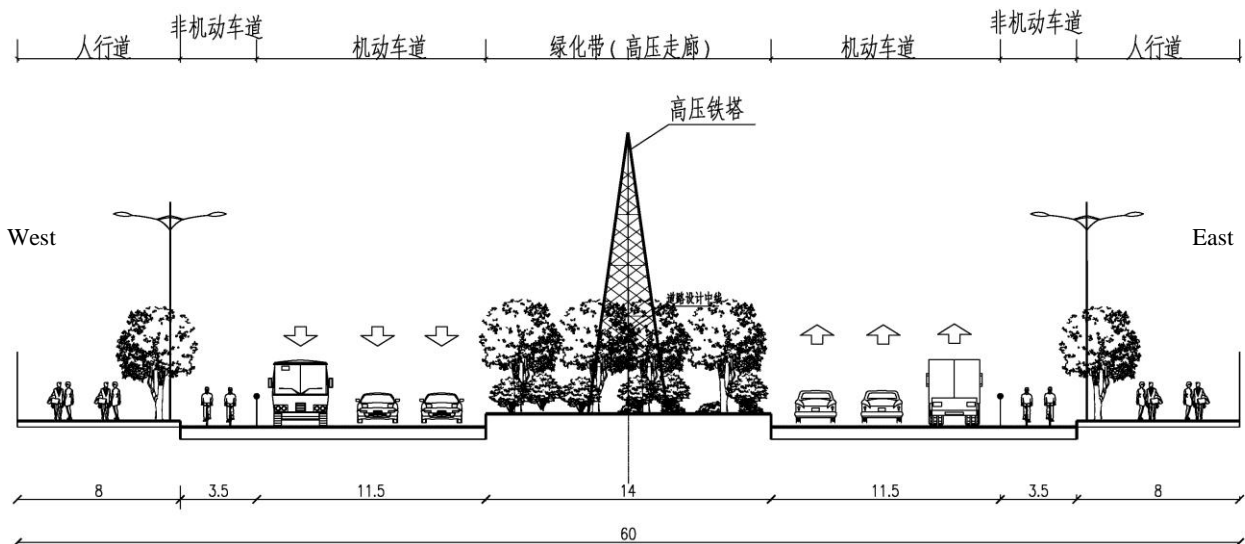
Reconstructed Cross Section of Jinqiu Avenue (Yinxing Avenue~Biyun Road)
